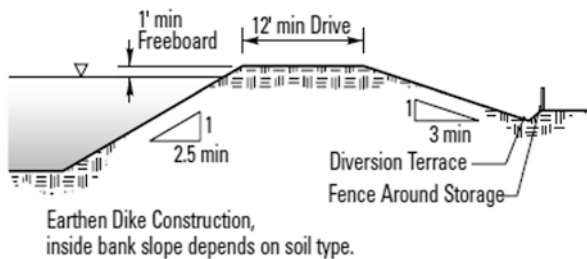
Holding pond for storing milk house wastewater [91]
